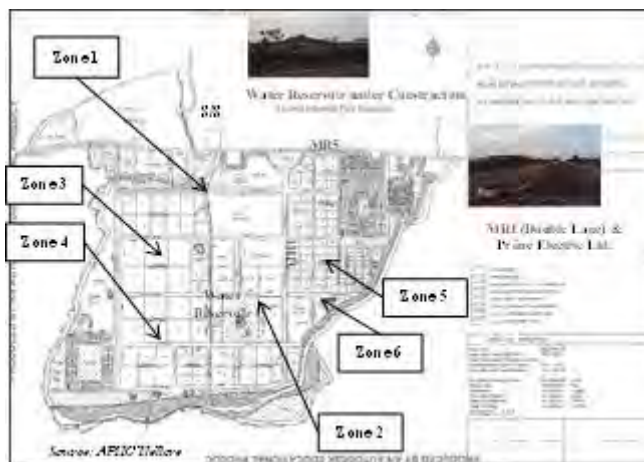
Layout Plan of Naidupet MPSEZ
